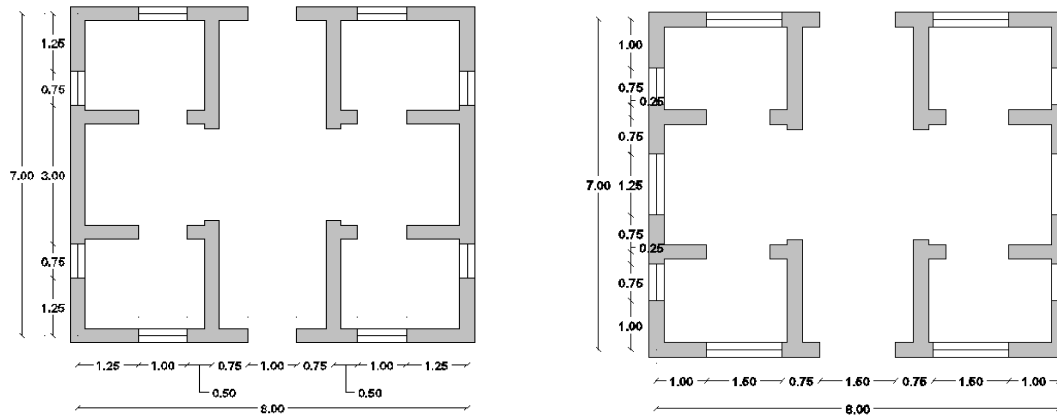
“Simple” building plans A, B, C (left) and D, E (right)
